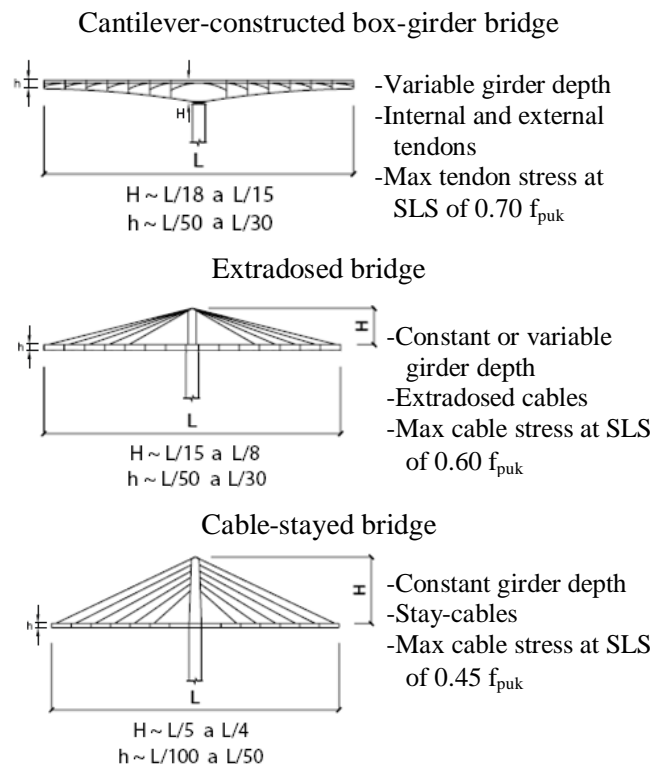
Comparison between cantilever-constructed box-girder, extradosed and cable-stayed bridges.
